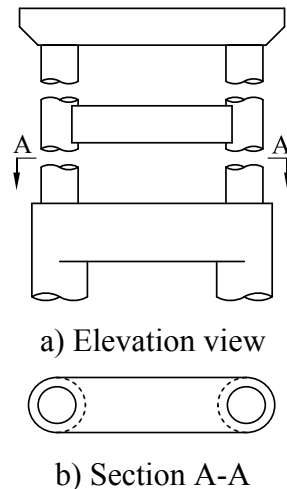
SR-300 Bridge pier alternative design with foundation consisting of (2) 9-ft diameter drilled shafts, connected by a strut or shear wall
